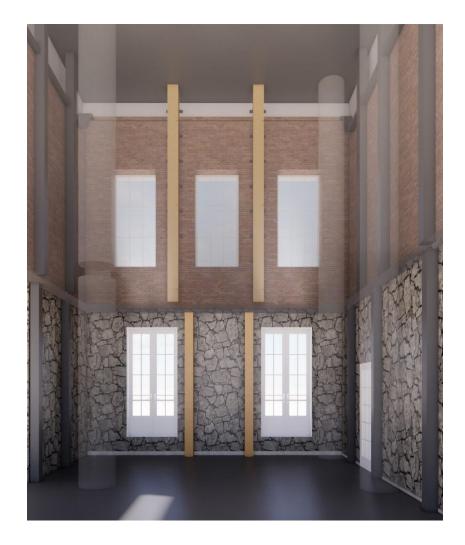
Part of Structural Retrofit of CG Building West Wall
